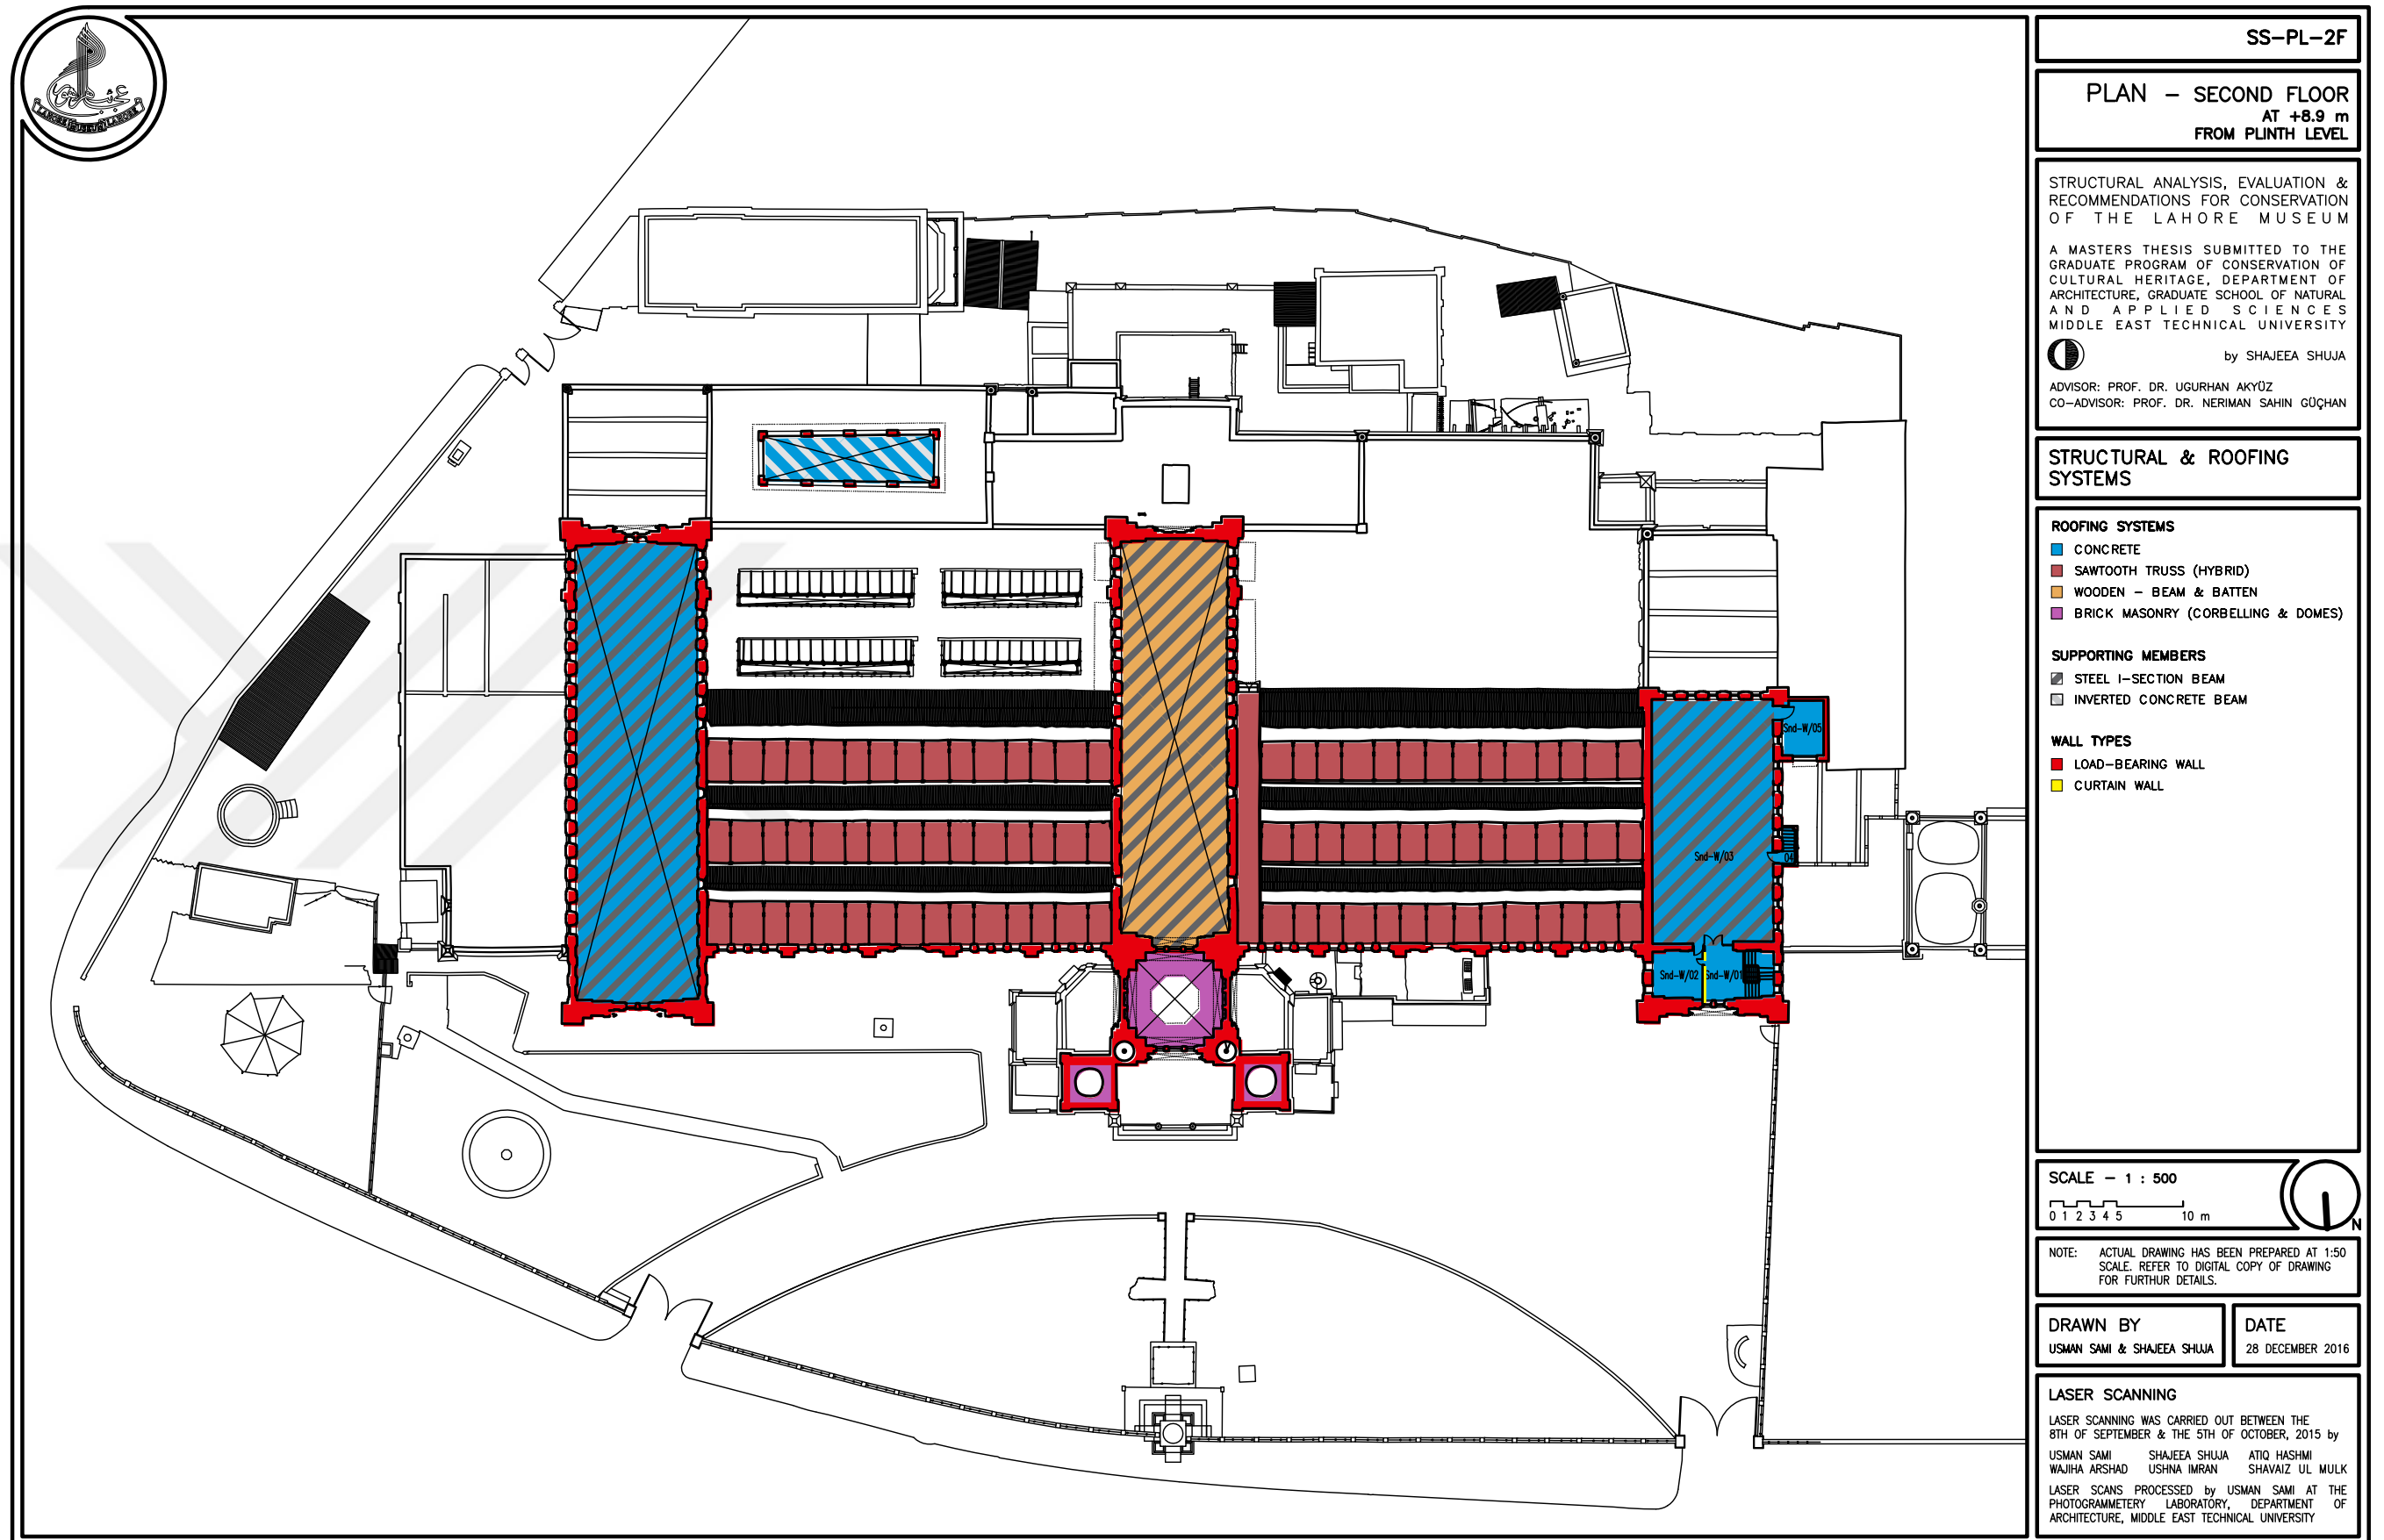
SS-PL-2F – Structural & Roofing Systems – Plan – Second Floor (2016)
